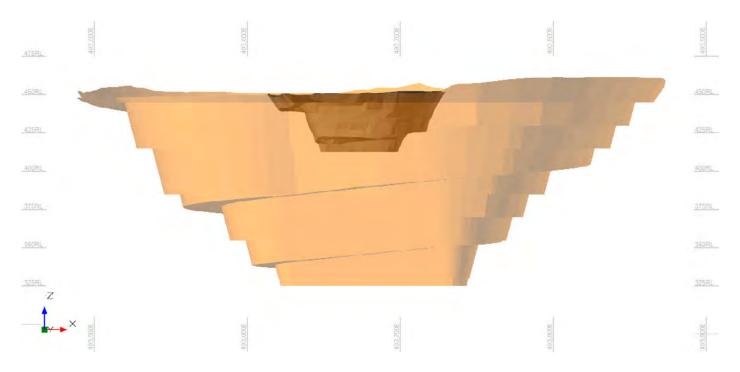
Wolverine open pit design – view looking North (trial pit shown in dark brown)
